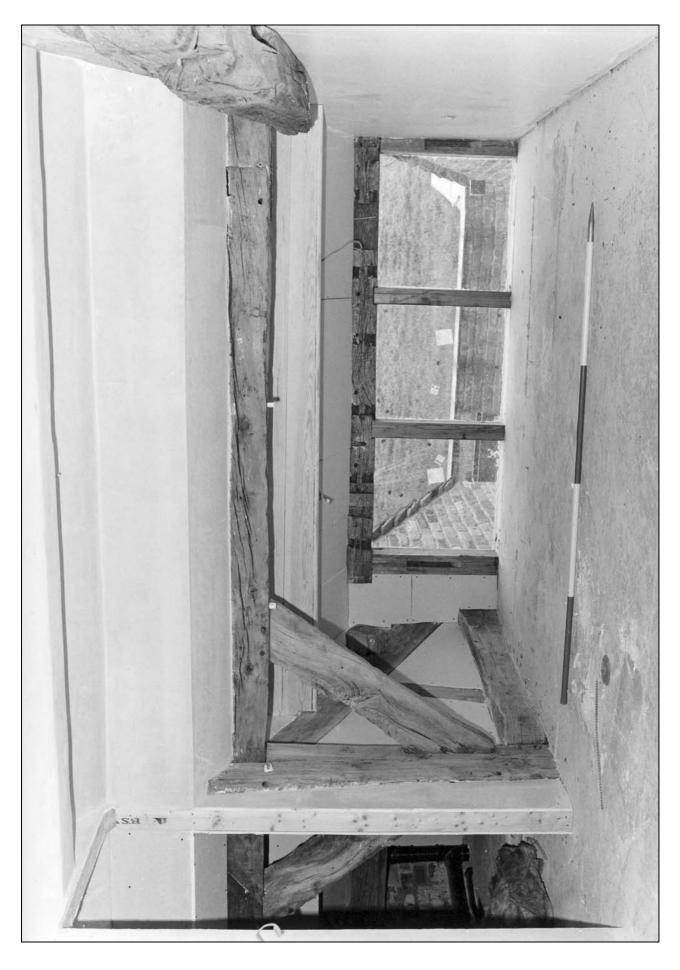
Carpenter's numbering at head of arcade post, from the north (film 1, frame 12)
